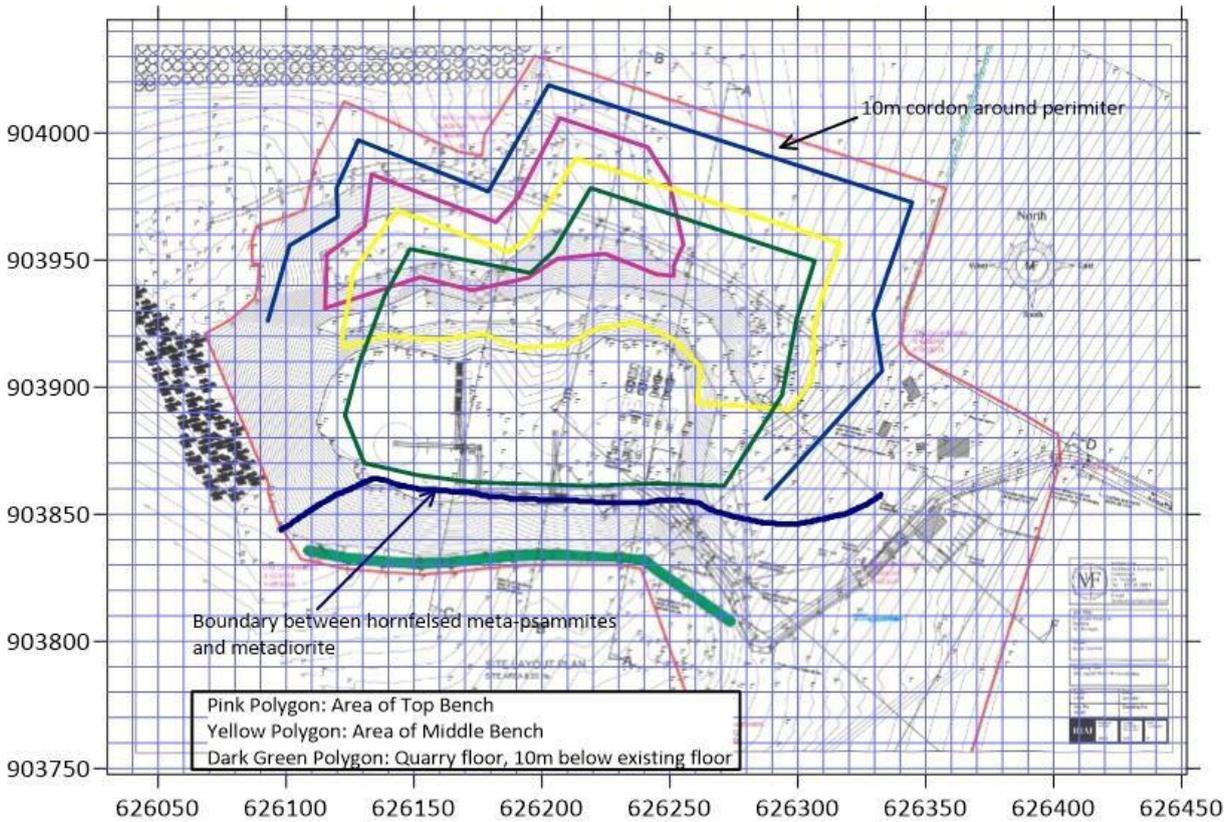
Quarry plan, based on original drawing by Michael Friel Architects, planned benches have been added.
